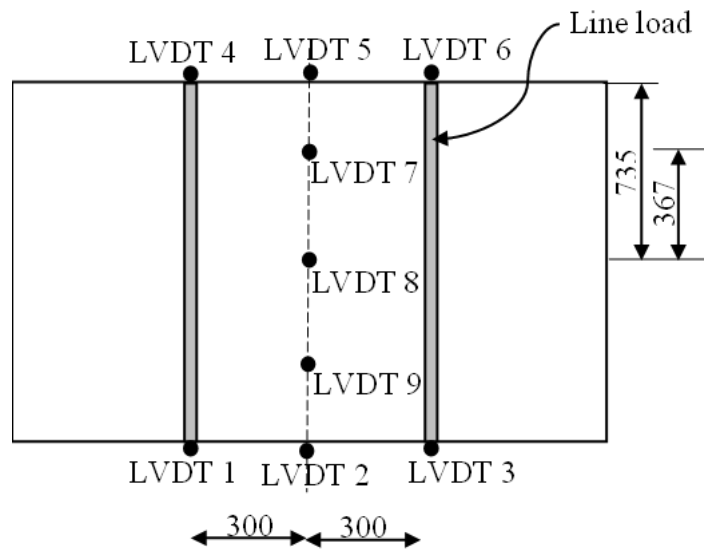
Instrumentation – location of LVDTs – plan (all dimensions are in mm)
